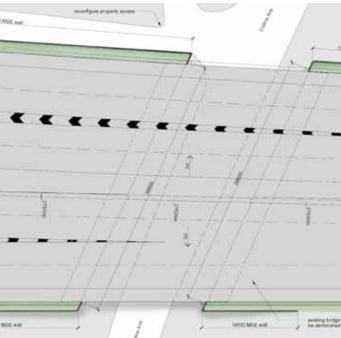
Bridge 26 Collins Avenue Bridge Elevation
